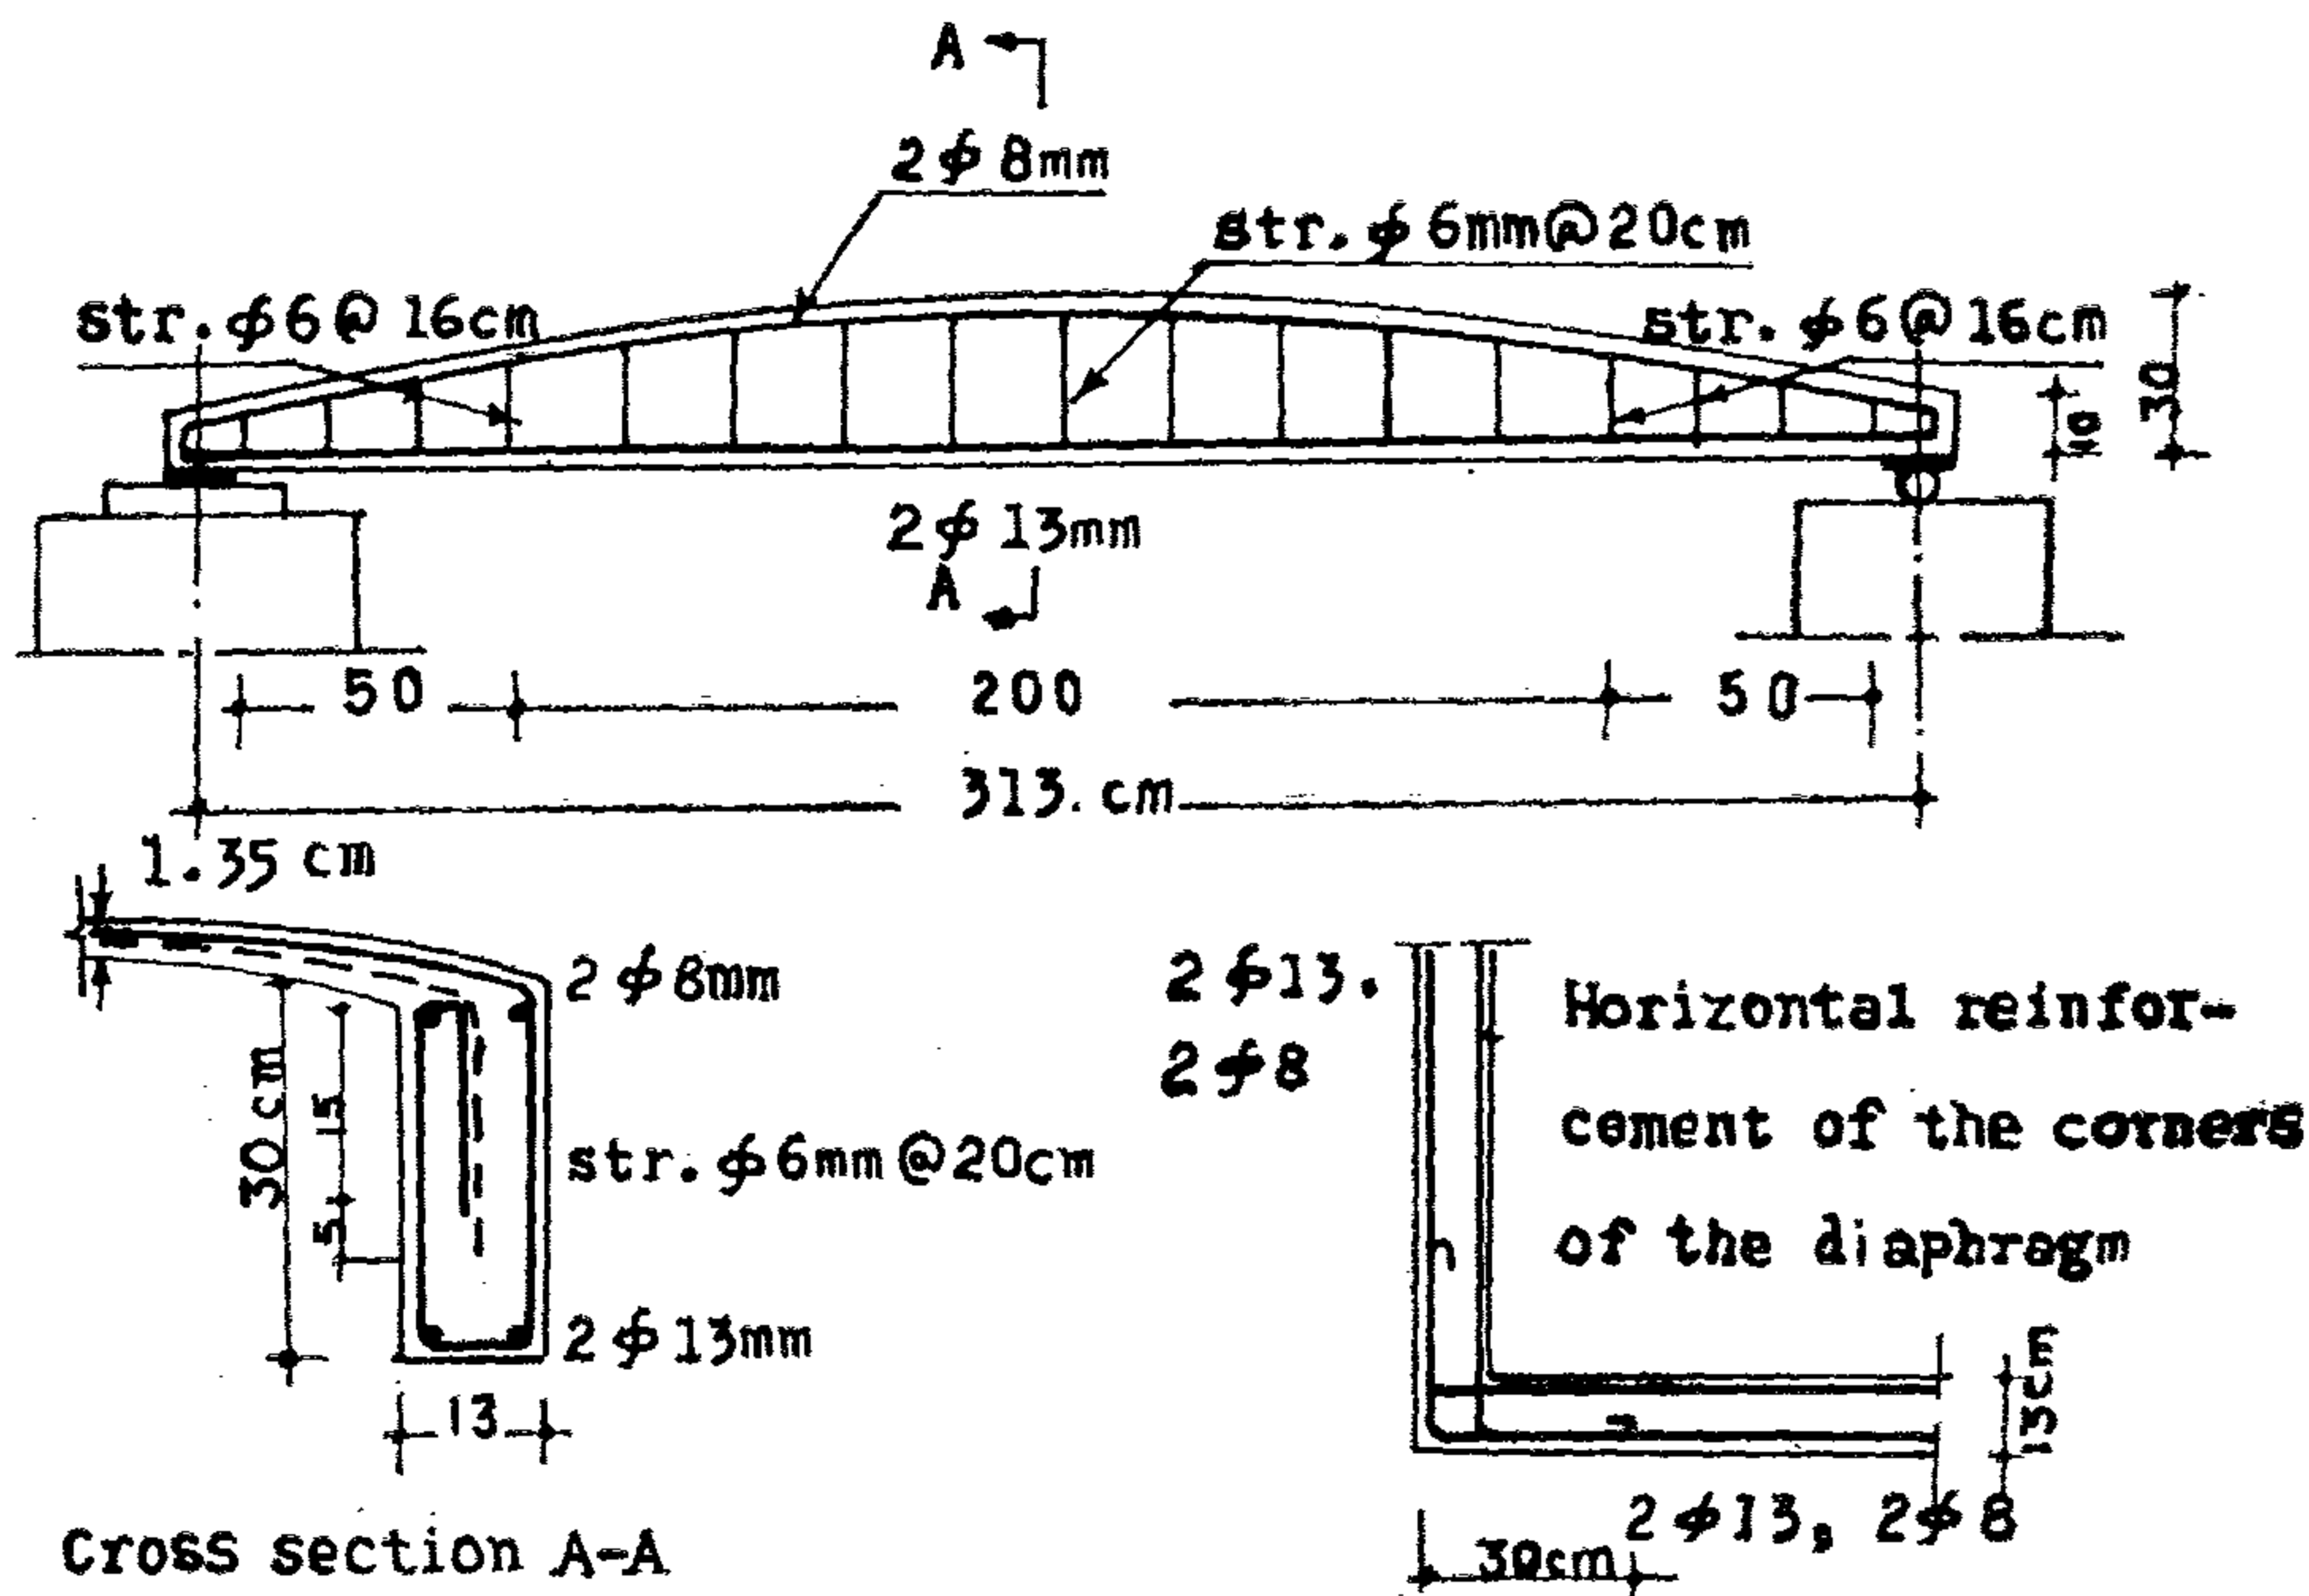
Reinforcement of the diaphragm (tested shell 3)
